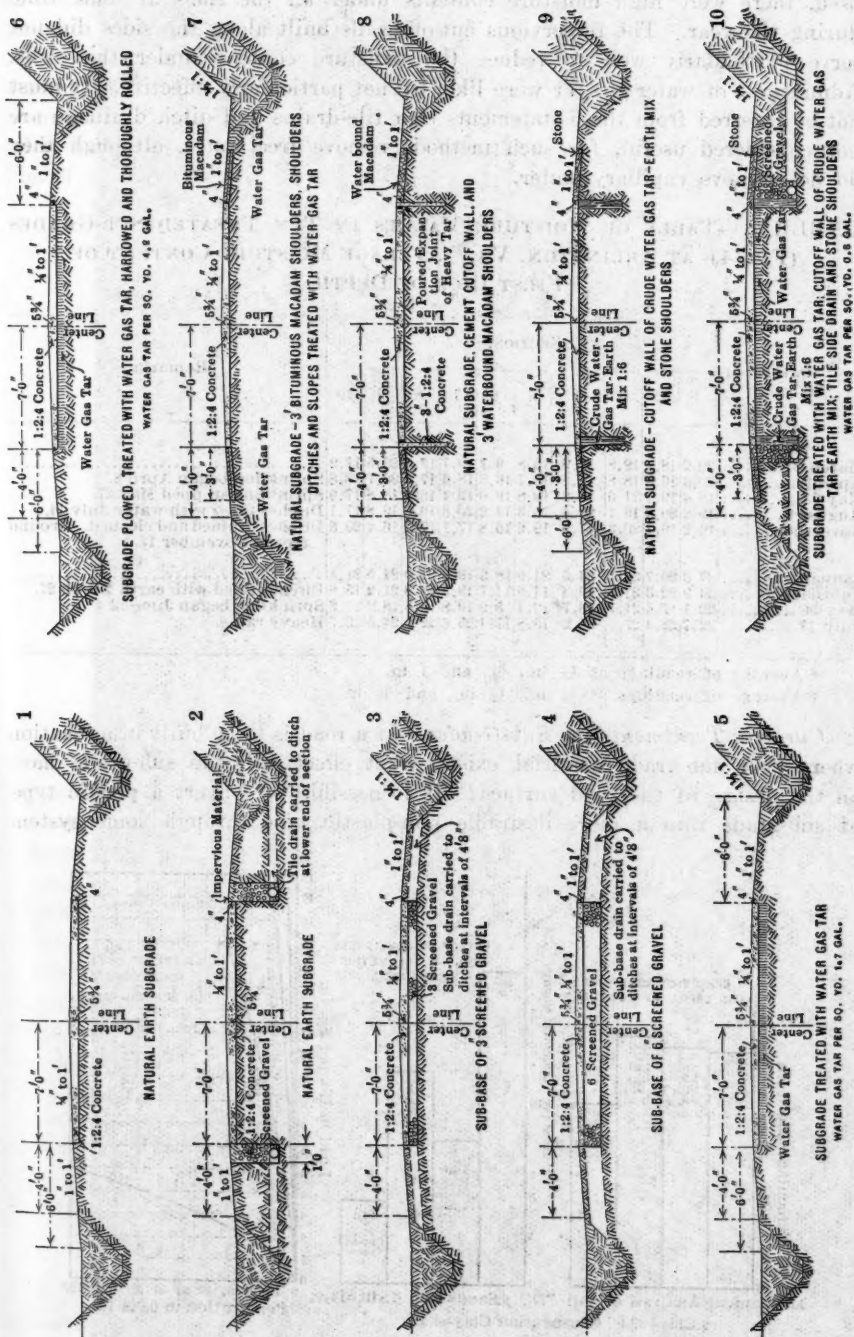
CROSS-SECTIONS, PAVEMENT TYPES 1 TO 10, FOR DRAINAGE AND SUB-GRADE EXPERIMENTS.
